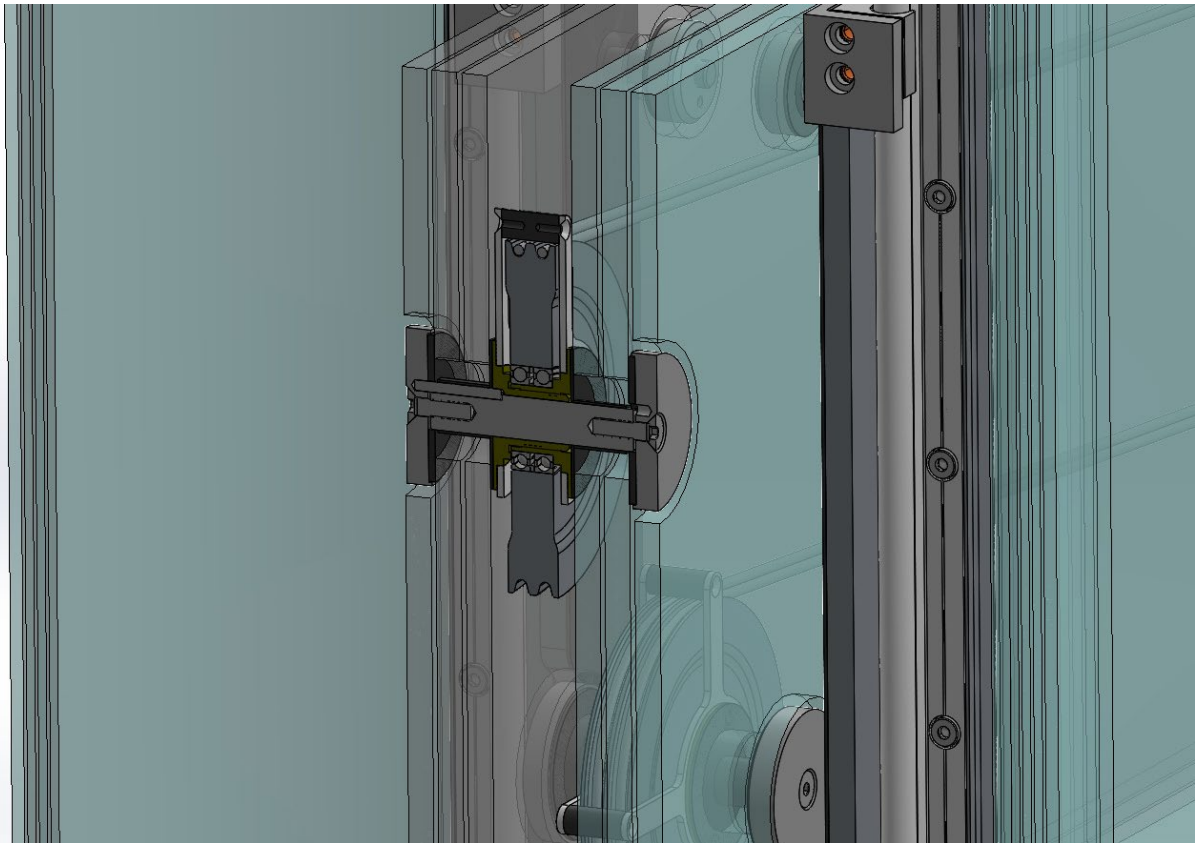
Section cut showing detail of upper sheave connection to glass beam. Image courtesy of TriPyramid.
